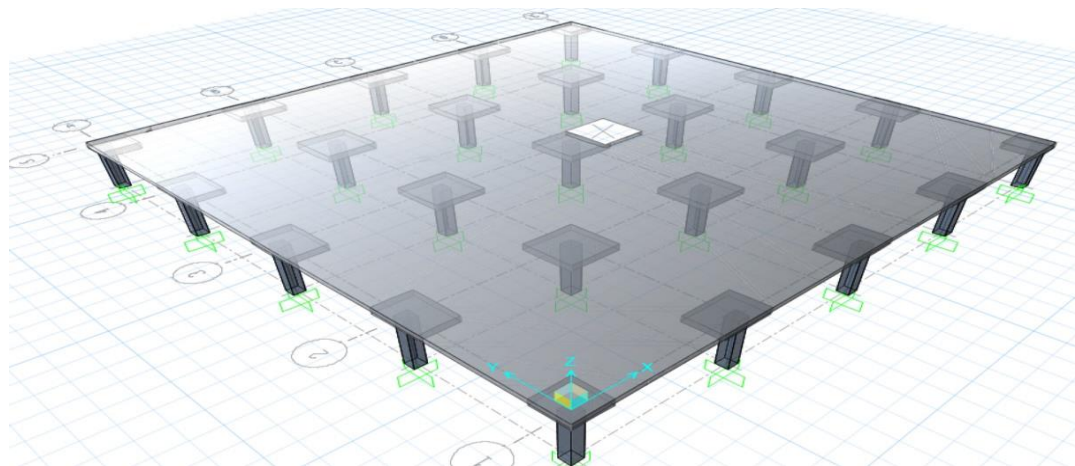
flat slab with a drop with opening at 0.5 m from column face in an isometric view
